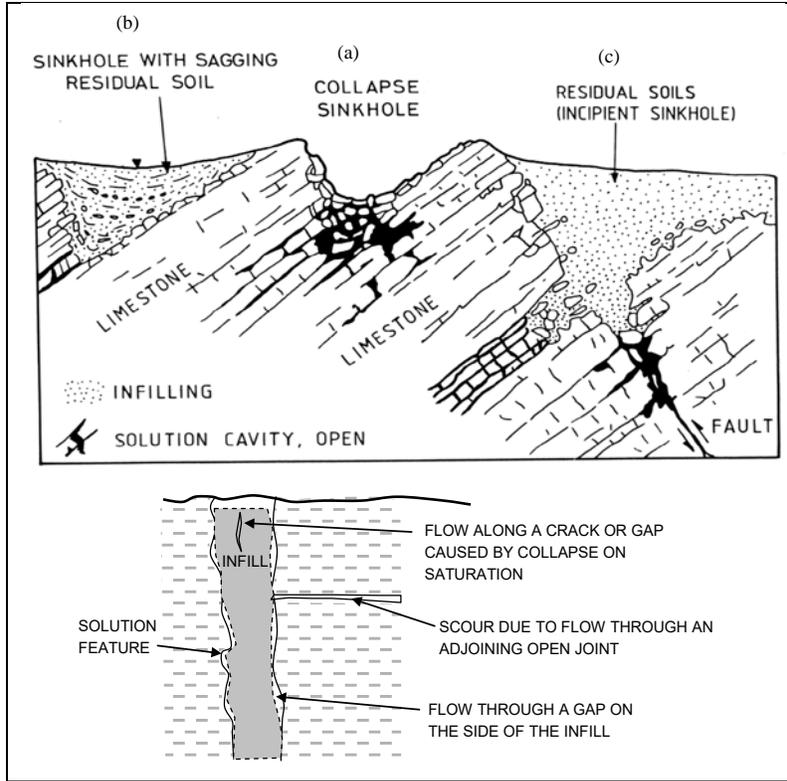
C-19.—Defects in rock foundations (Fell et al. 2008).
